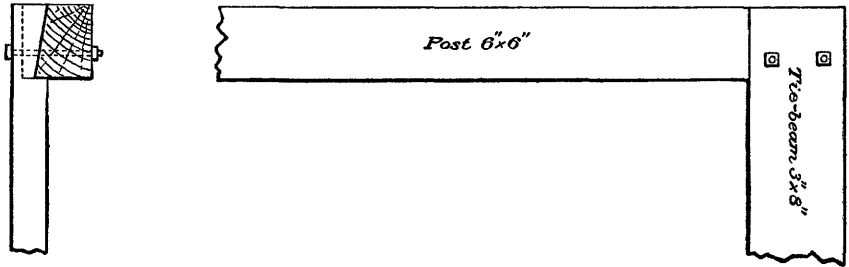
Joint designed to connect tiebeams with vertical posts.
